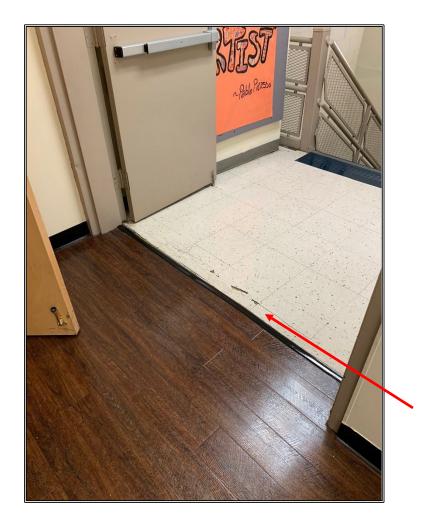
& 33 Damaged VAT in the Hallway in Room 209
